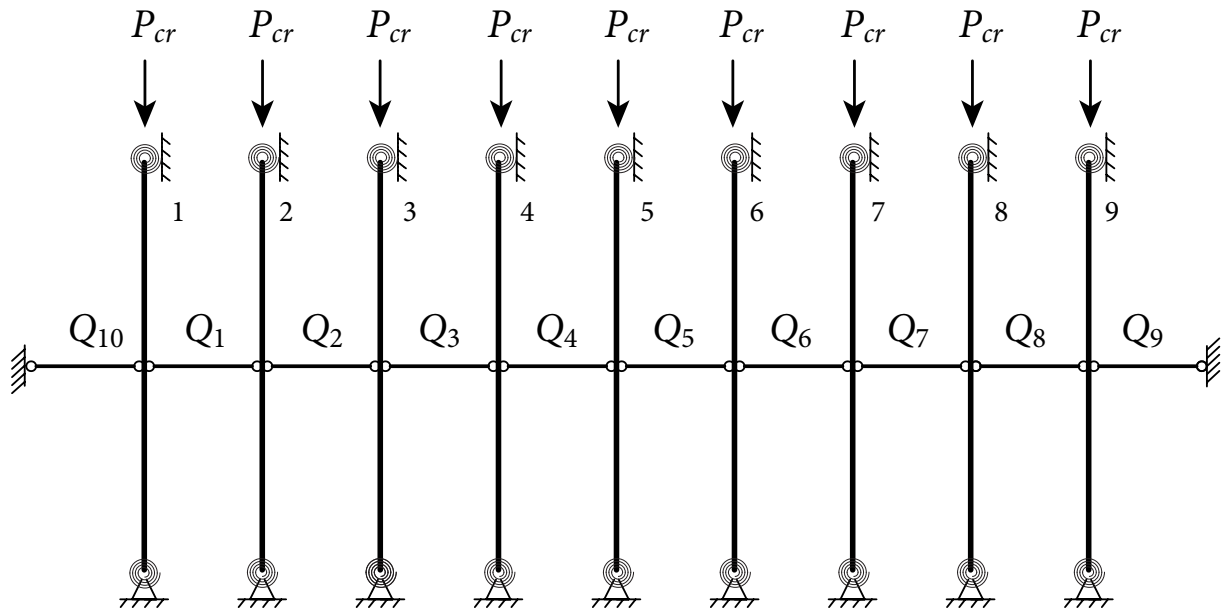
Diagram of a cold-formed load-bearing wall anchored on both sides
